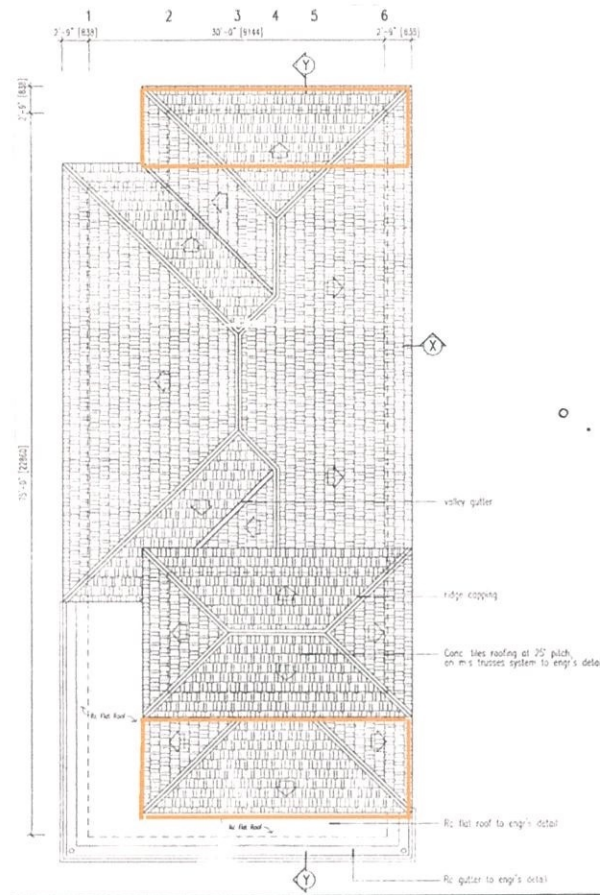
Roof Plan of Bungalow House in Taman Dato' Wan, Ampangan
